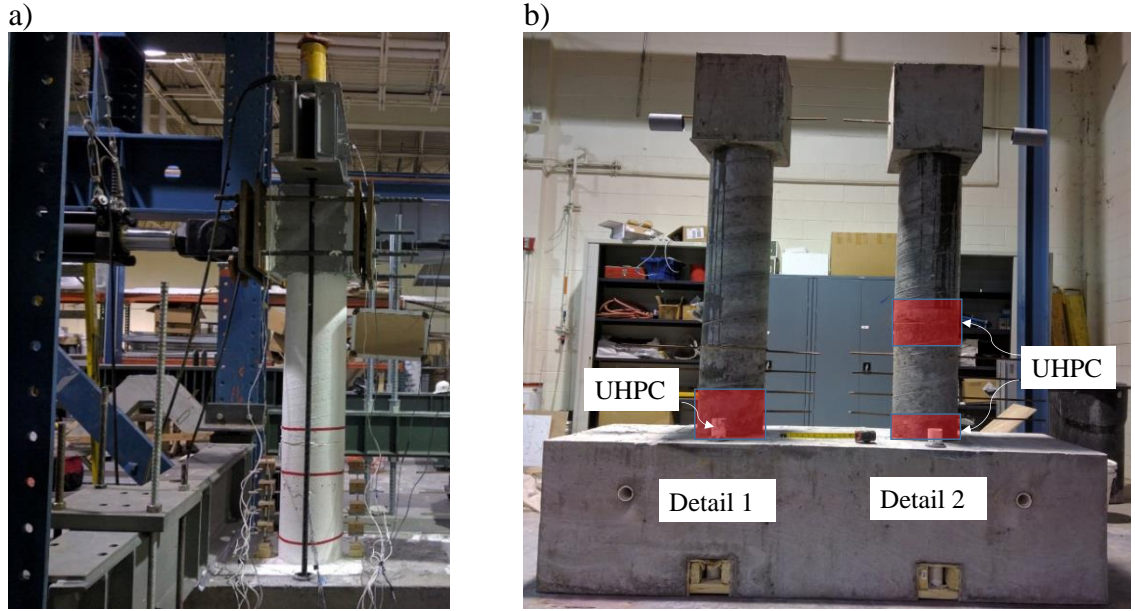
Constructed specimens and loading setup a) Loading setup overview b) Constructed specimens.
